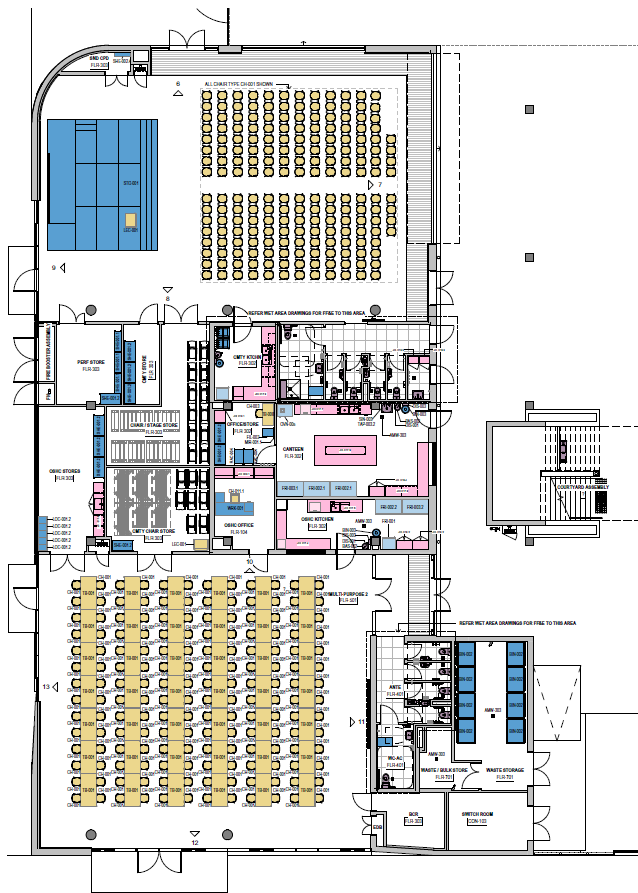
Seating plan for Communal Hall and Multi Purpose Space 2
